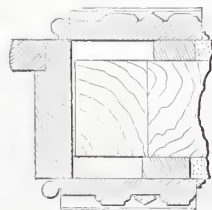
Section Through Door Frames.—Scale, $1\frac{1}{2}$ Inches to the Foot.
